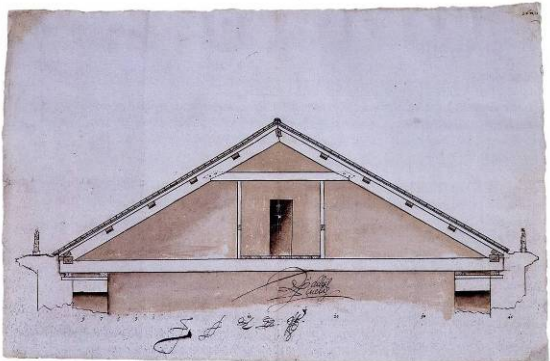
Central nave truss according to Pedro Brizuela (Segovia, 1555, 1631).
